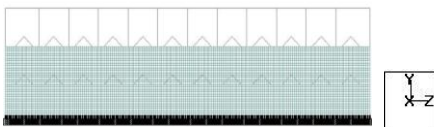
Typical Floor Plan of Looms Industry of Ground Floor and First Floor
